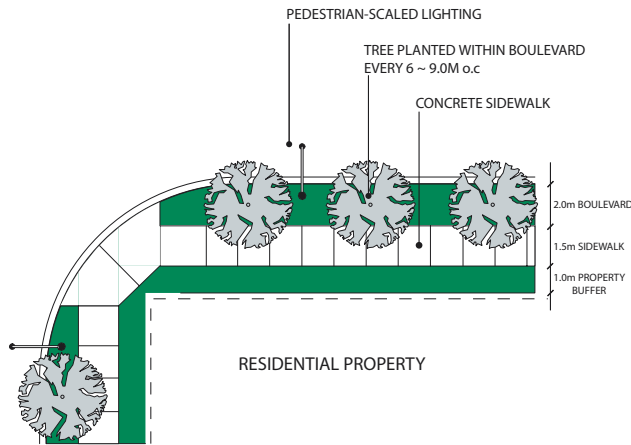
A typical corner plan that incorporates site details to enhance the pedestrian experience.
